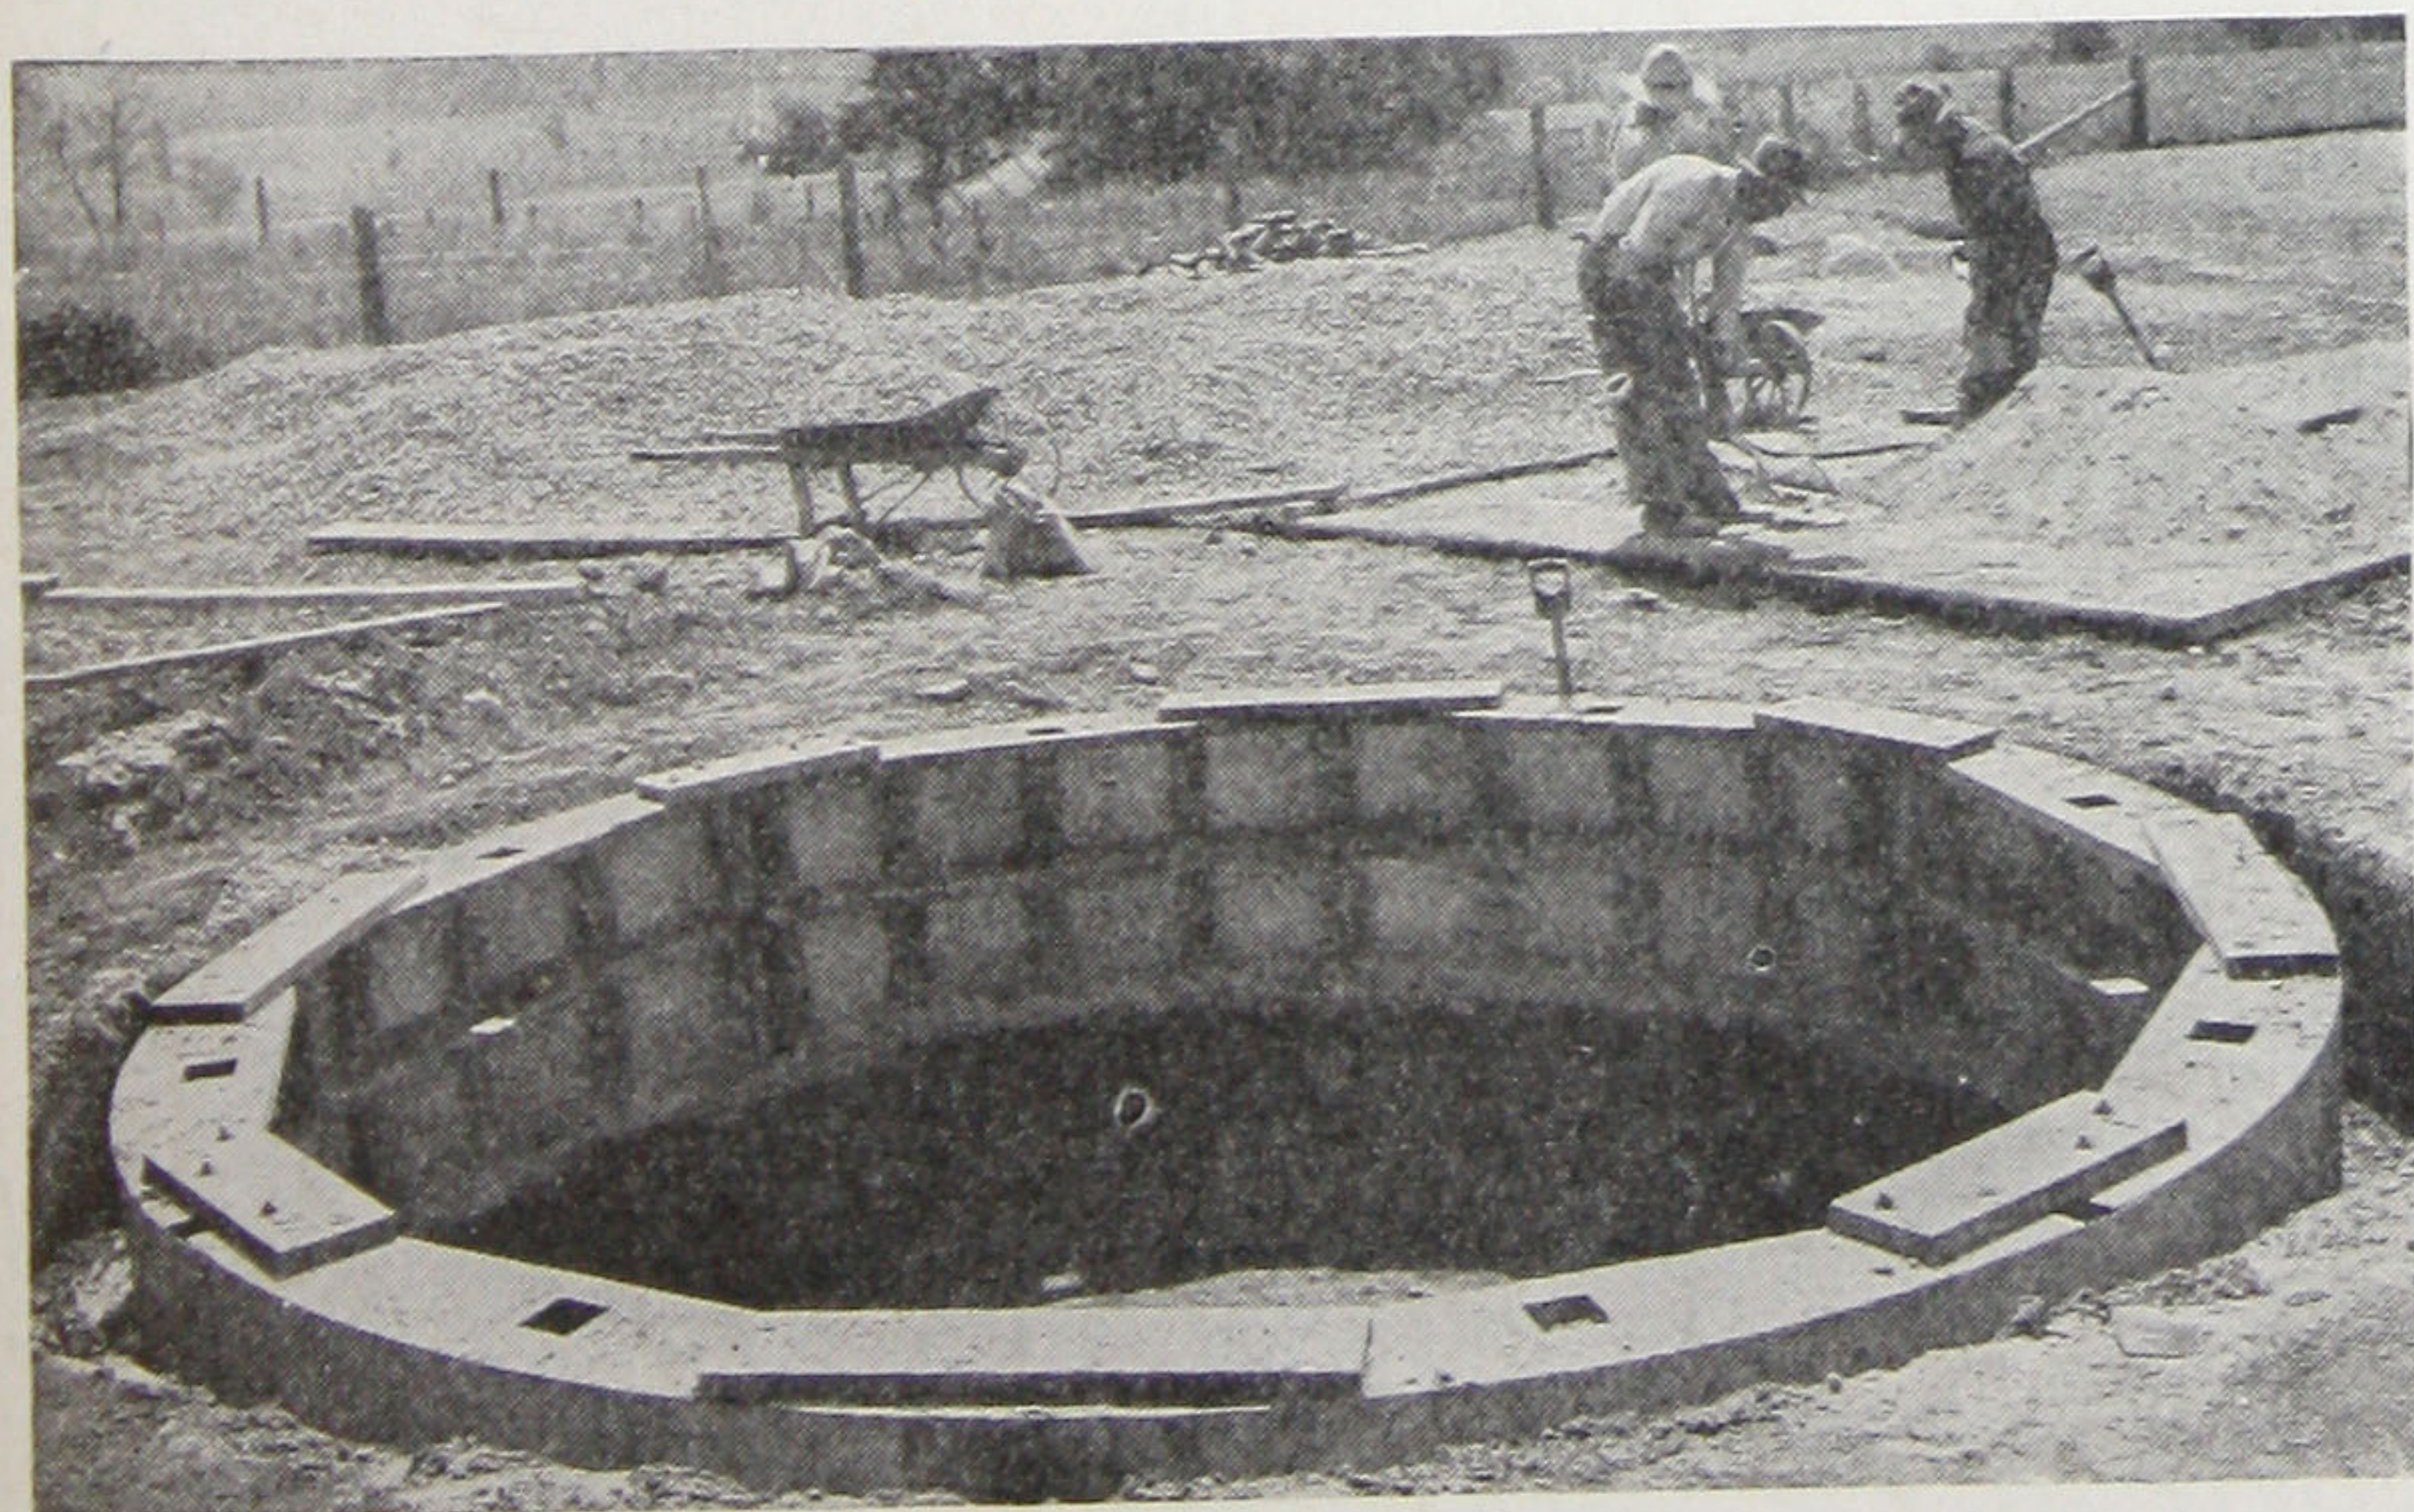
Inside section of circular form in place. Outside form will be used above ground level.
